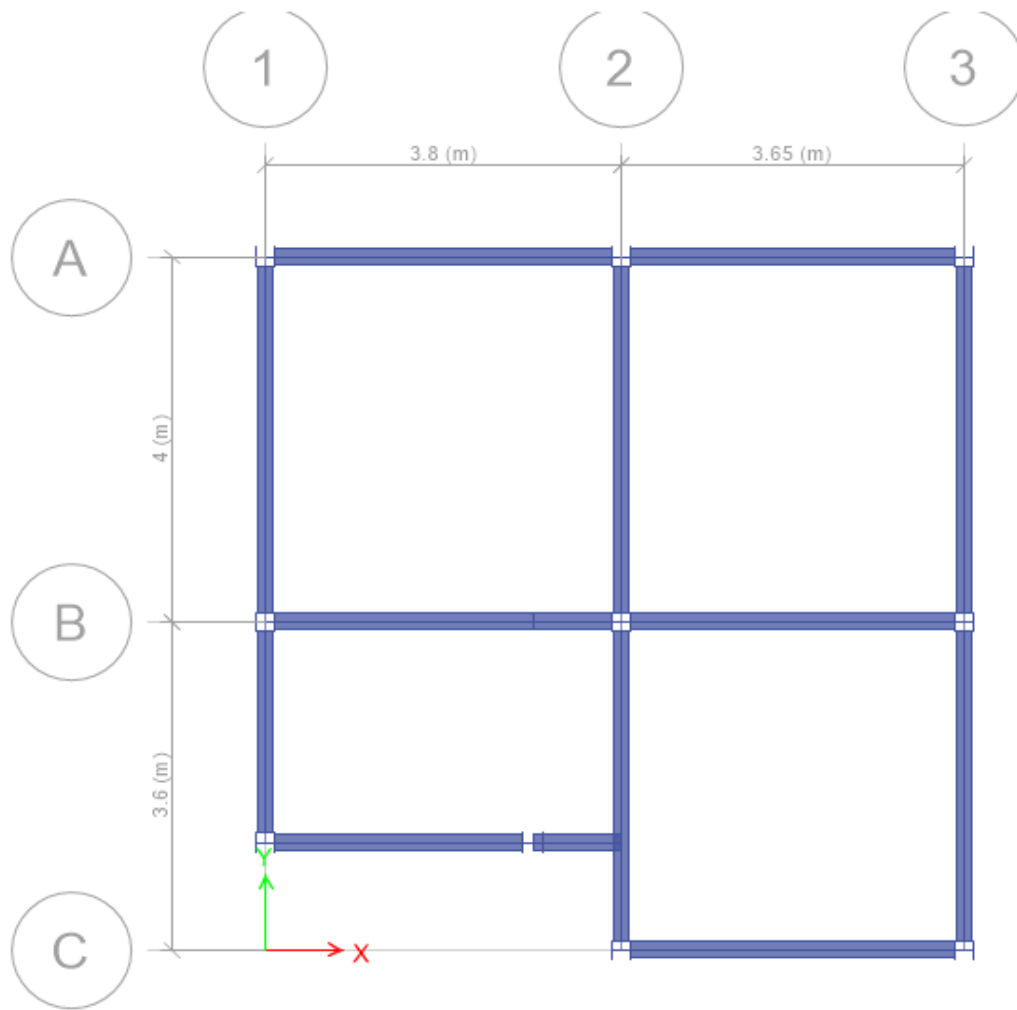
Typical first floor plan for new proposed steel structure (ETABS 2016 ultimate)
